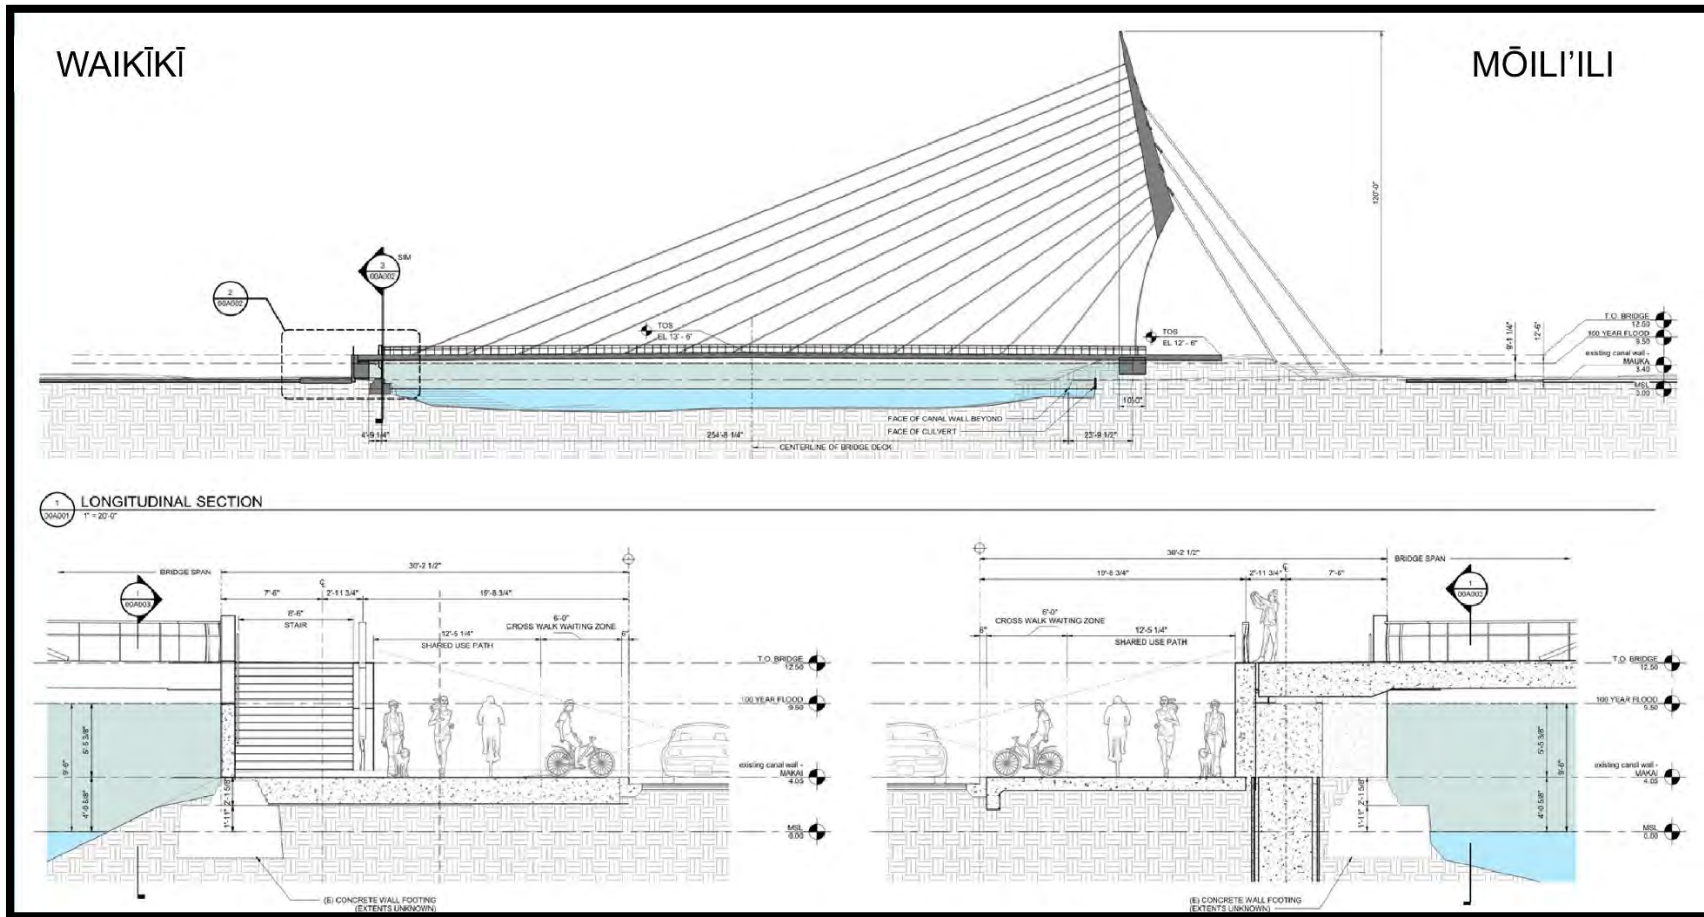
Portion of a preliminary construction plan showing a cross-section of the proposed Ala Pono Bridge (Courtesy of HDR Inc.)
